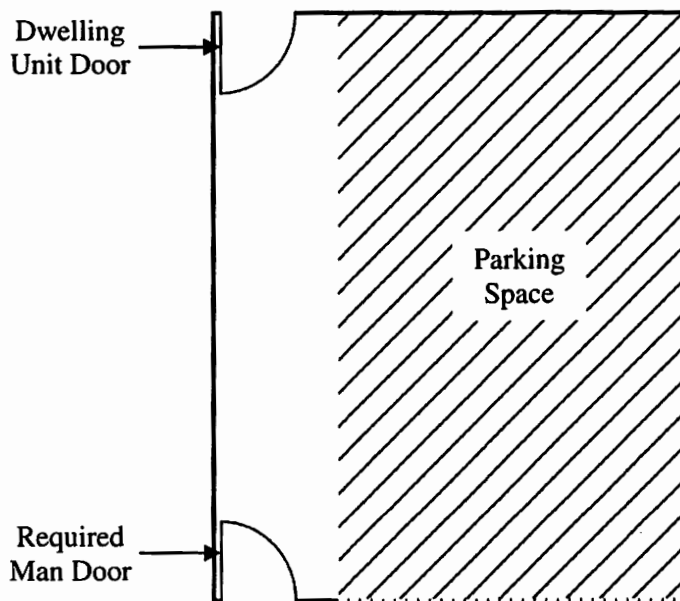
Example of private garage configuration where direct access is provided to a dwelling unit.
